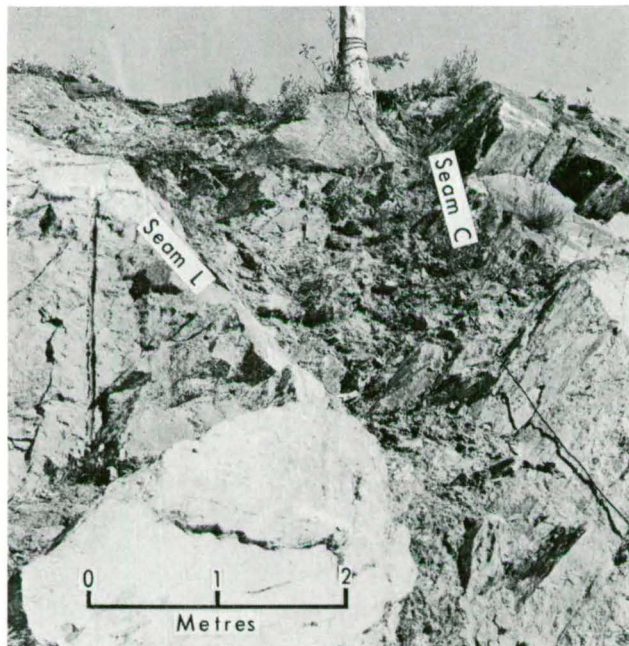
Lower part of wedge mass No. 2 in grout cap excavation. The wedge toes out 15 feet above grout cap, block C.
